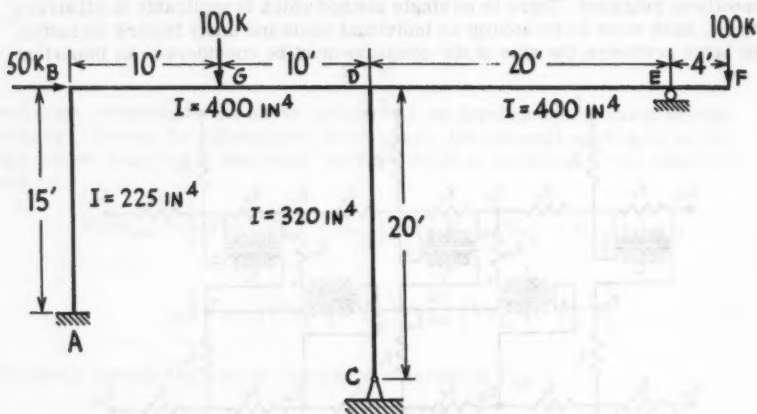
EXAMPLE BUILDING FRAME PROBLEM
